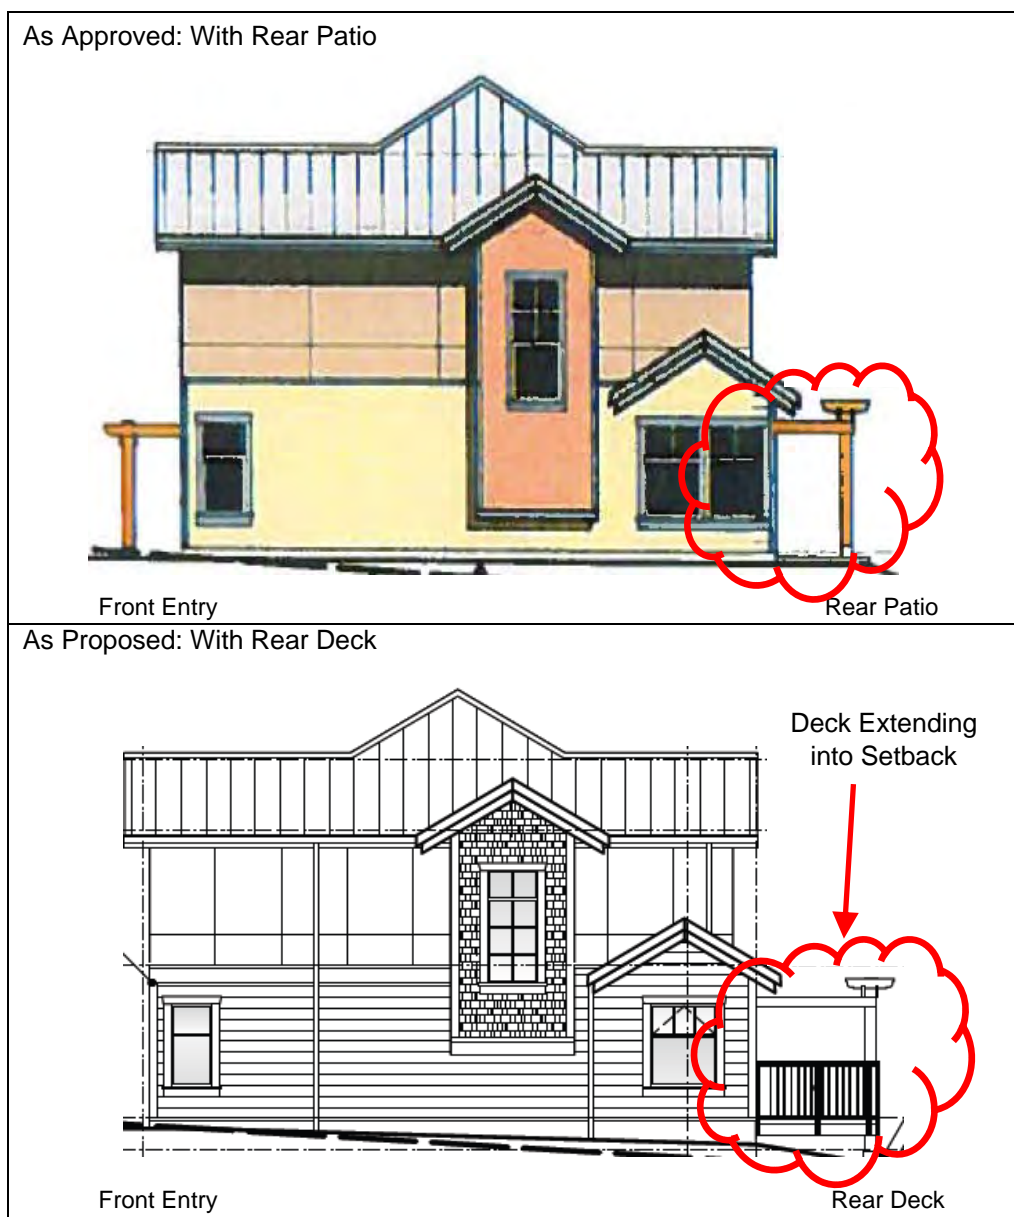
Proposed Variance for Deck (Reduced from 4.5 m to 2.6 m)
